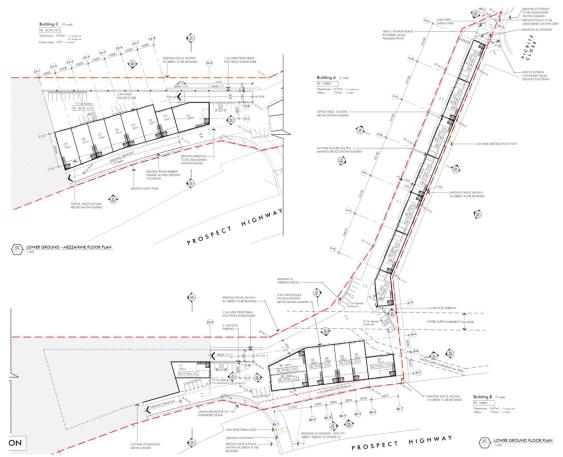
Precinct F Lower Ground Floor Plan – As Currently Approved (Source: Nettleton Tribe)
